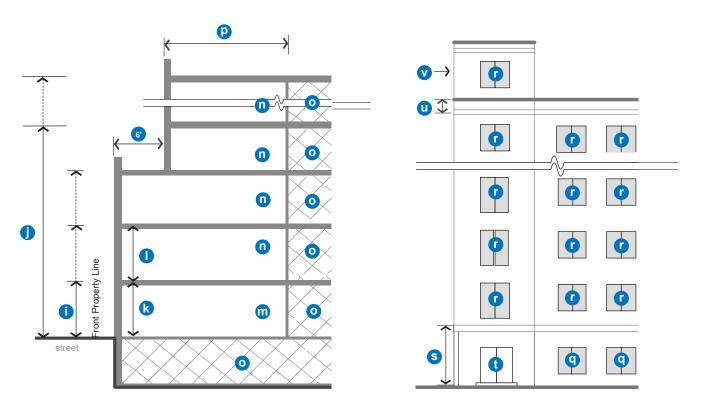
(B)(2) General Stoop Building: Height and Use Requirements
